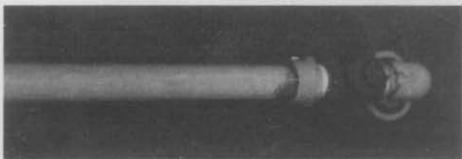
Spear installed in trench prior to back-filling, showing brass non-return valve, elbow at top of 25 mm riser pipe, and near horizontal 25 mm pipe to T-junction.
